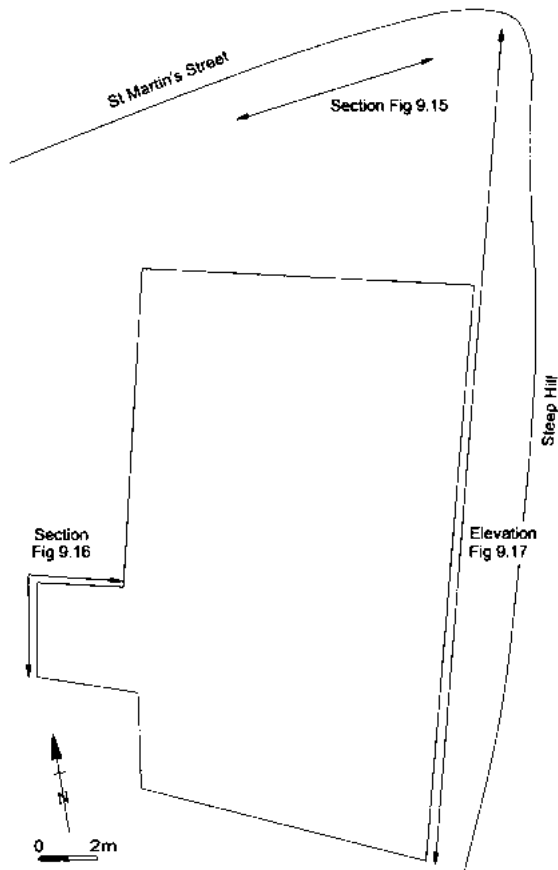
Plan showing location of sections and elevation, sh74.
